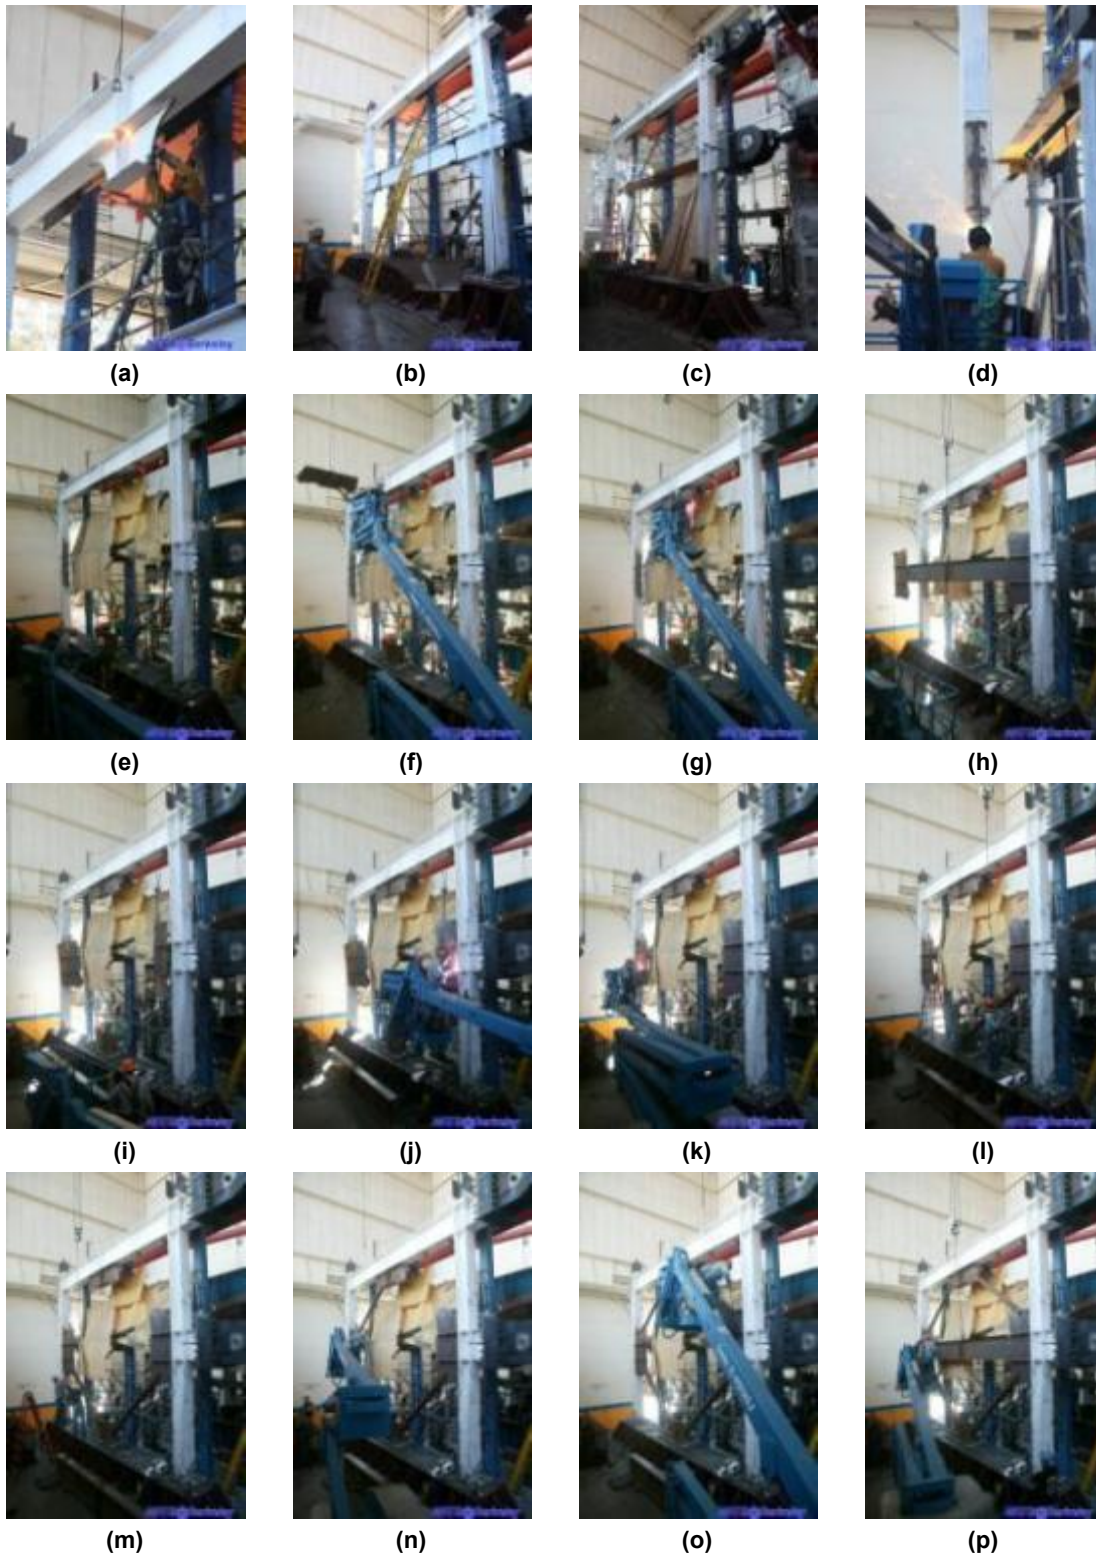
Specimen TCBF-B-2: key construction steps.
